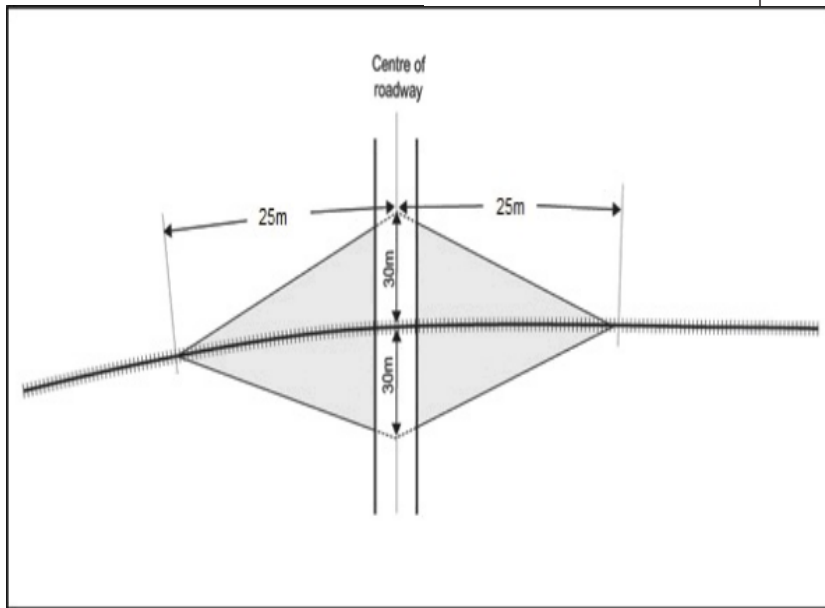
Approach sight triangles for public road / rail siding level crossings .
